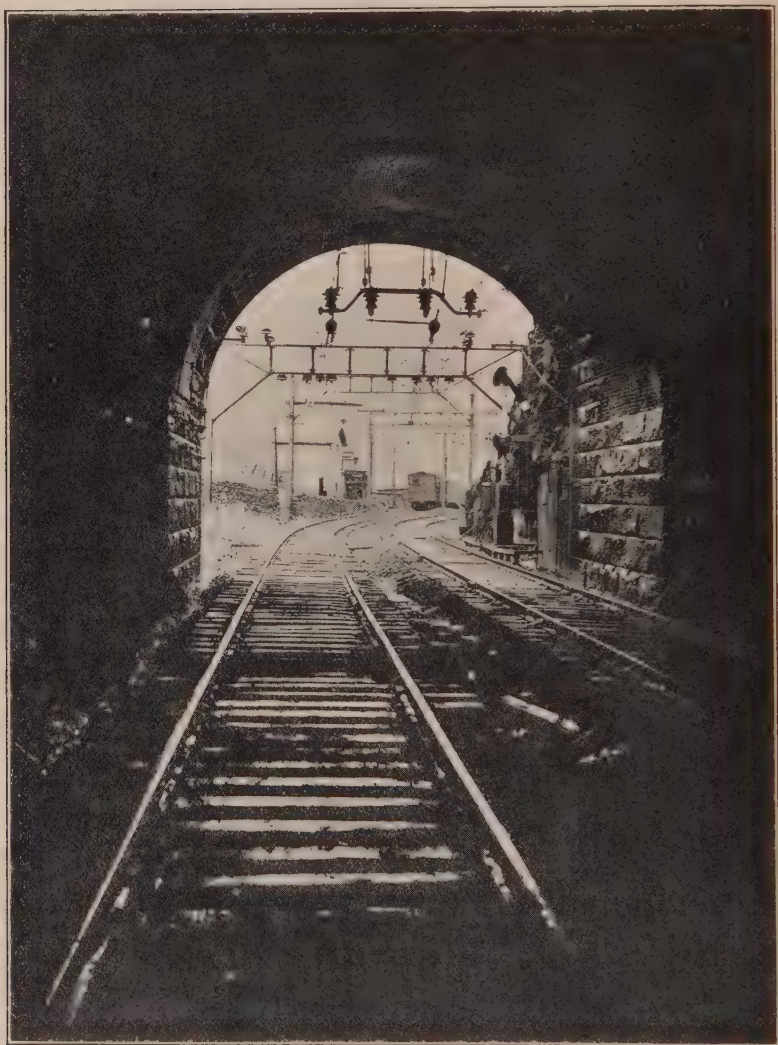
Boston & Maine Railroad, Hoosac Tunnel. Tunnel and approach construction.
